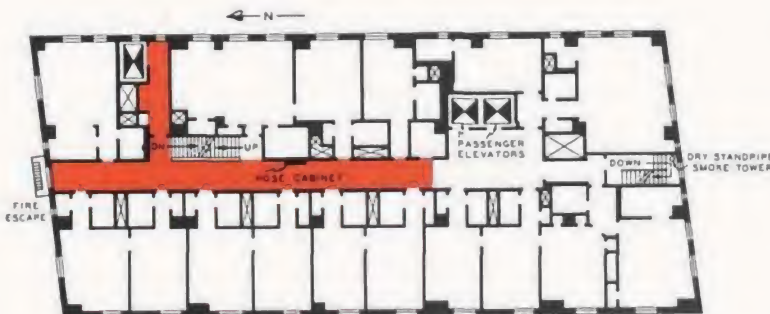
Floor plan of the tenth floor, which is typical of the seventh through eleventh stories. The shading indicates the area on the tenth floor destroyed by fire.
